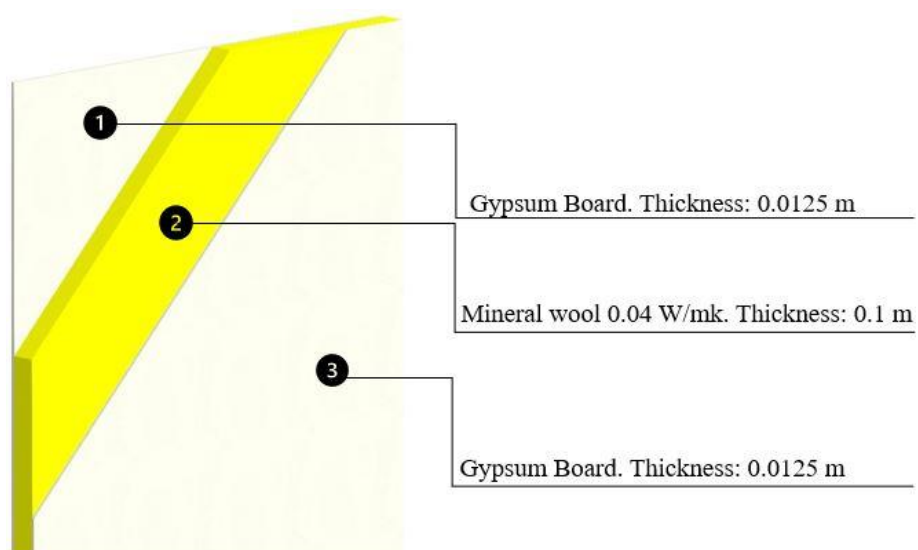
Inner walls of the measured apartment. Byggforsk 524.233 Interior walls with steel posts.
